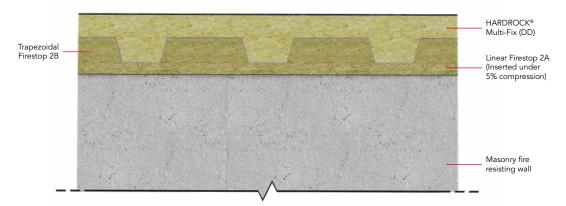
ROCKWOOL Insulated flat roof deck with profiles perpendicular to the wall line
